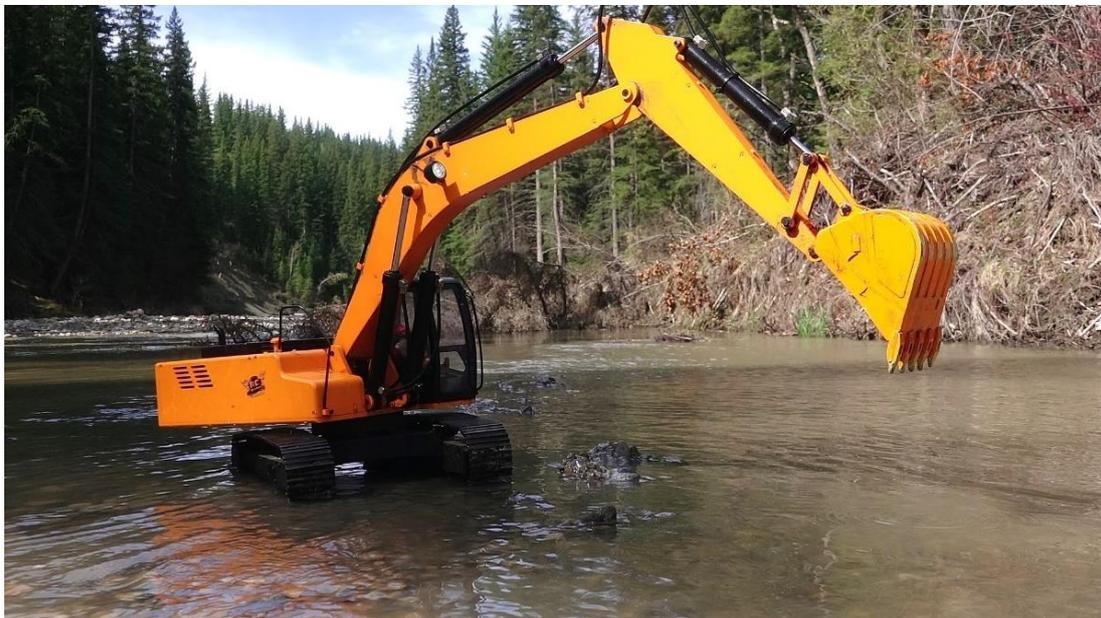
An example of an excavator being used to extract sand from a shallow channel
